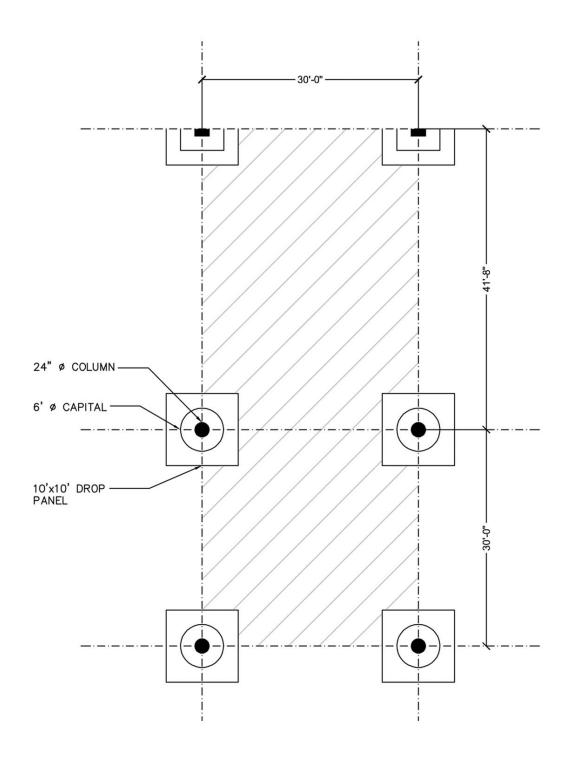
TYPICAL FLAT SLAB LAYOUT
